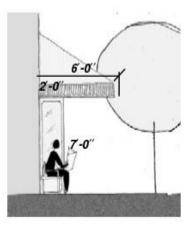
(E): Examples of encroachments into the sidewalk.
